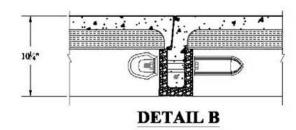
TYPICAL WALL CONNECTION DETAIL
